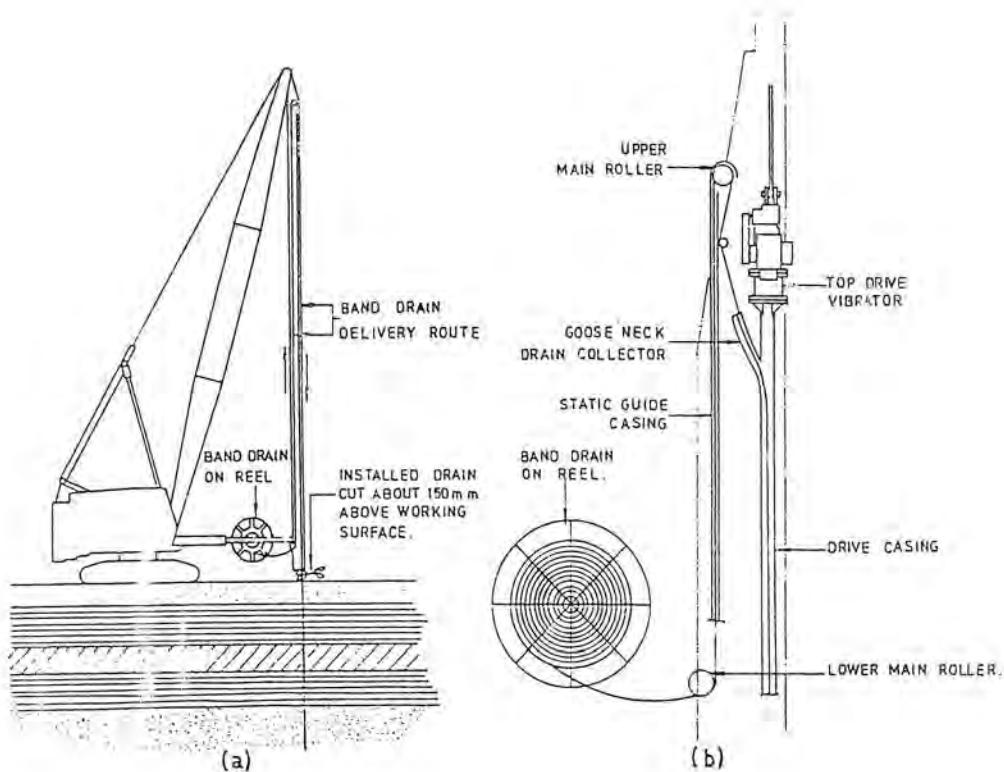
Schematic Sketch of a Band Drain Installation Rig: (a) General Arrangement of Installation Rig; (b) Band Drain Delivery Arrangement
